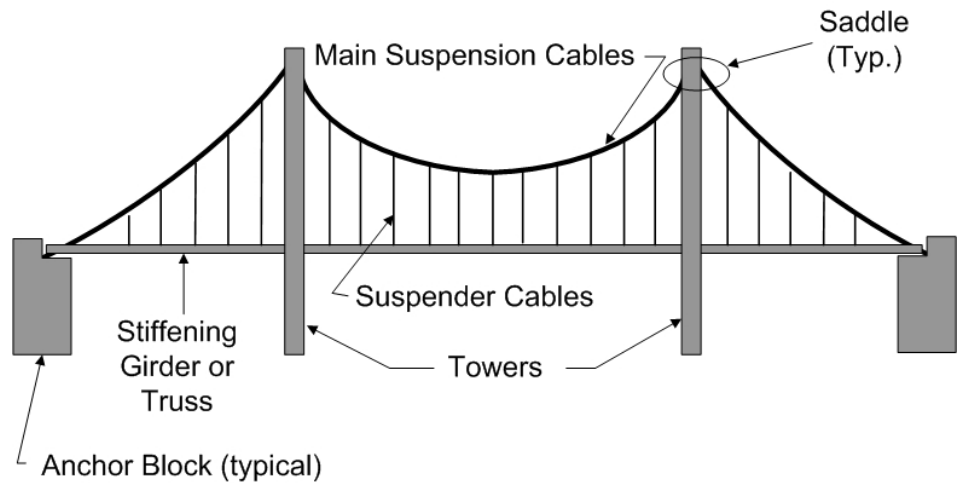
Three-Span Suspension Bridge Schematic
